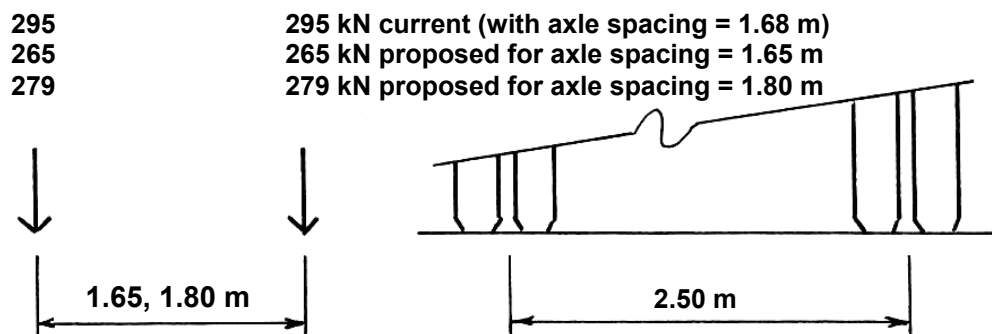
Tentative design loadings for the timber decks corresponding to Heavy Off-highway Design Truck
